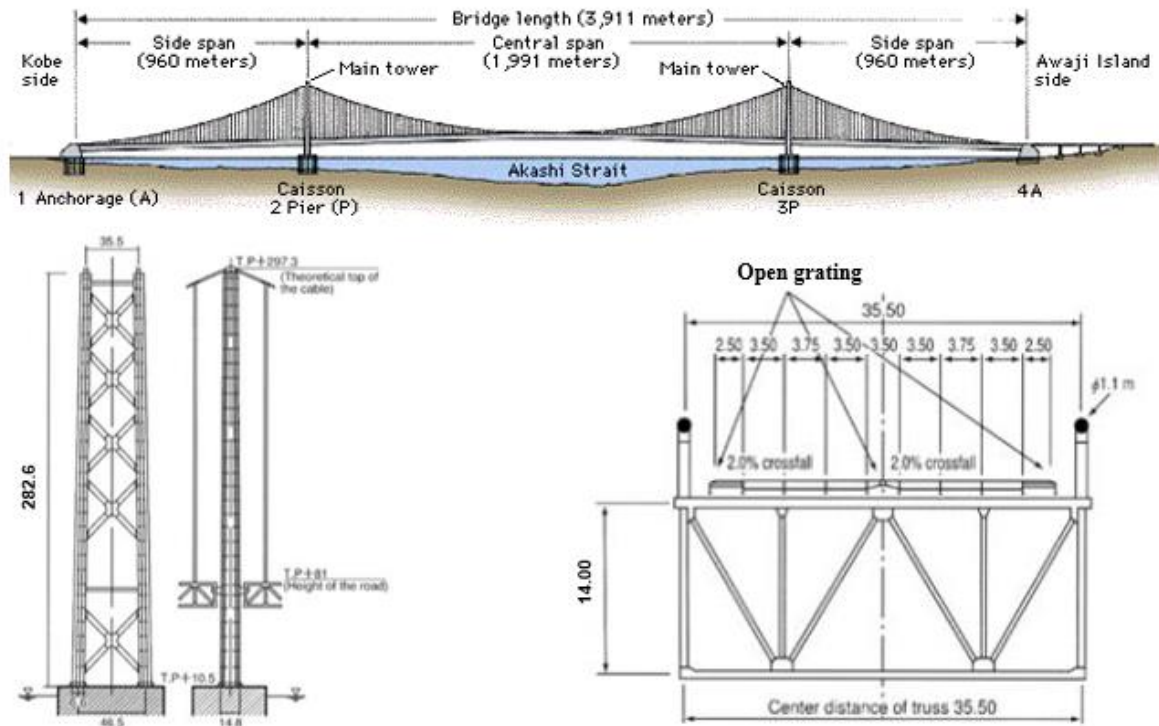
Geometric layout of the Akashi Kaikyo Bridge.
